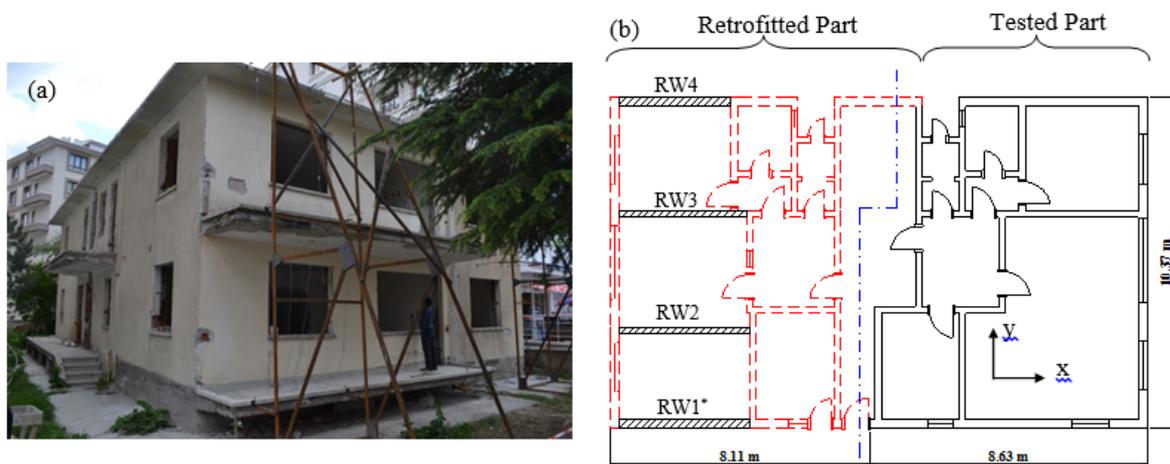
The First Test Structure: (a) Photo and (b) Plan View
